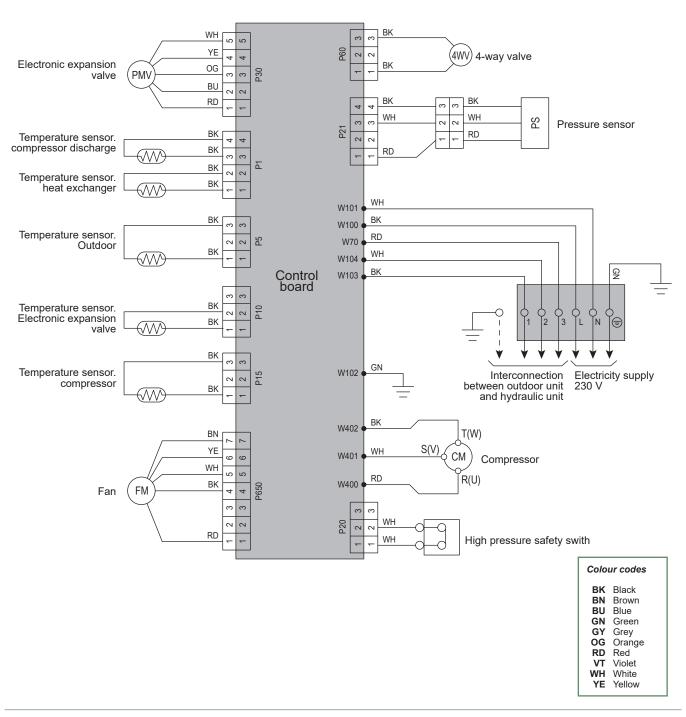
Outdoor unit electrical cabling model 5,6 & 8
